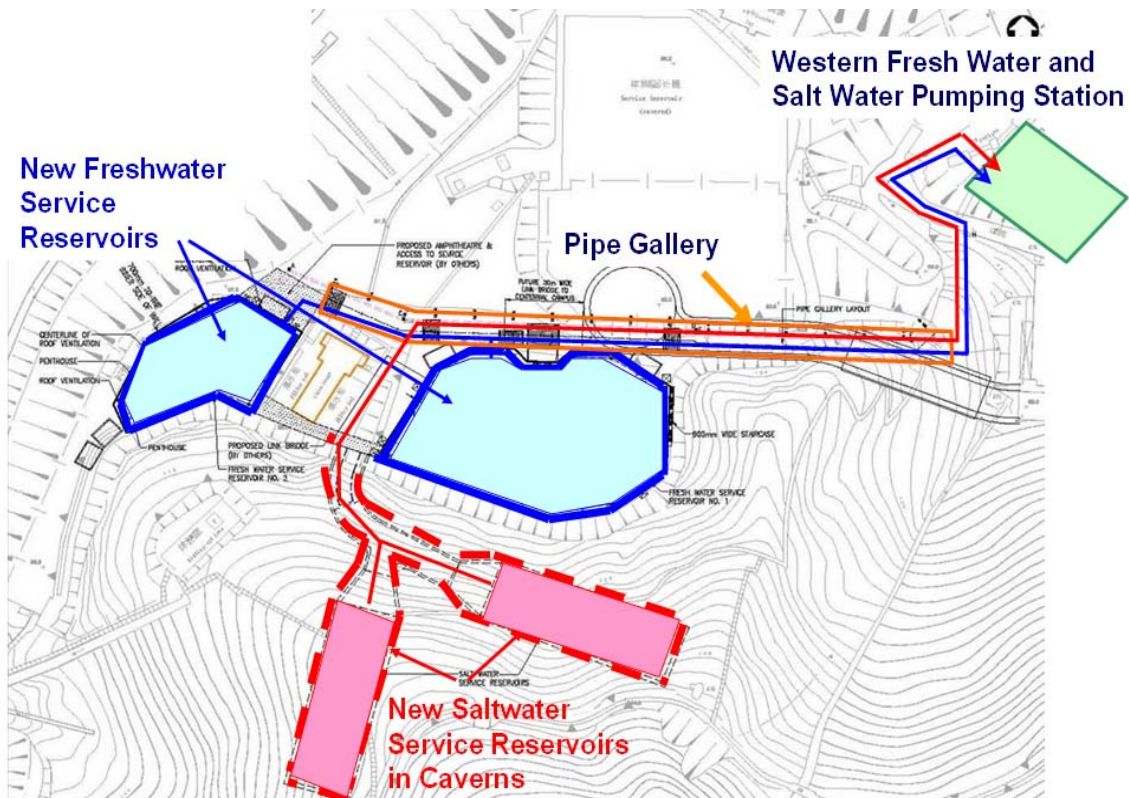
A general layout plan showing scheme for the re-provision of waterworks facilities
